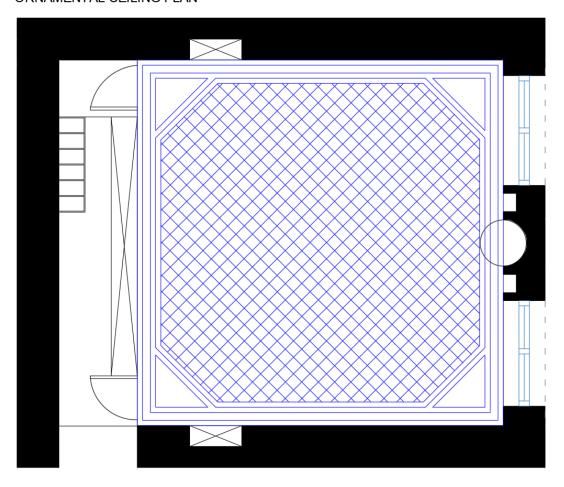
Ornamental ceiling plan of oda e miqëve at Ëngjëll Çeka's house [24].
